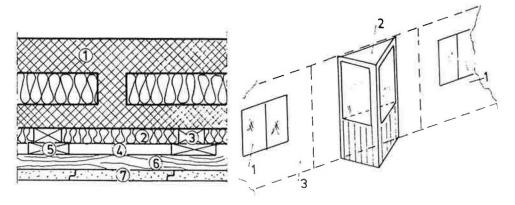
Horizontal section through the external wall: 1- initial wall with thermal bridges; 2-expanded polystyrene; 3- vertical laths; 4- air layers; 5- distance-pieces; 6- horizontal laths; 7-POLYALPAN band
